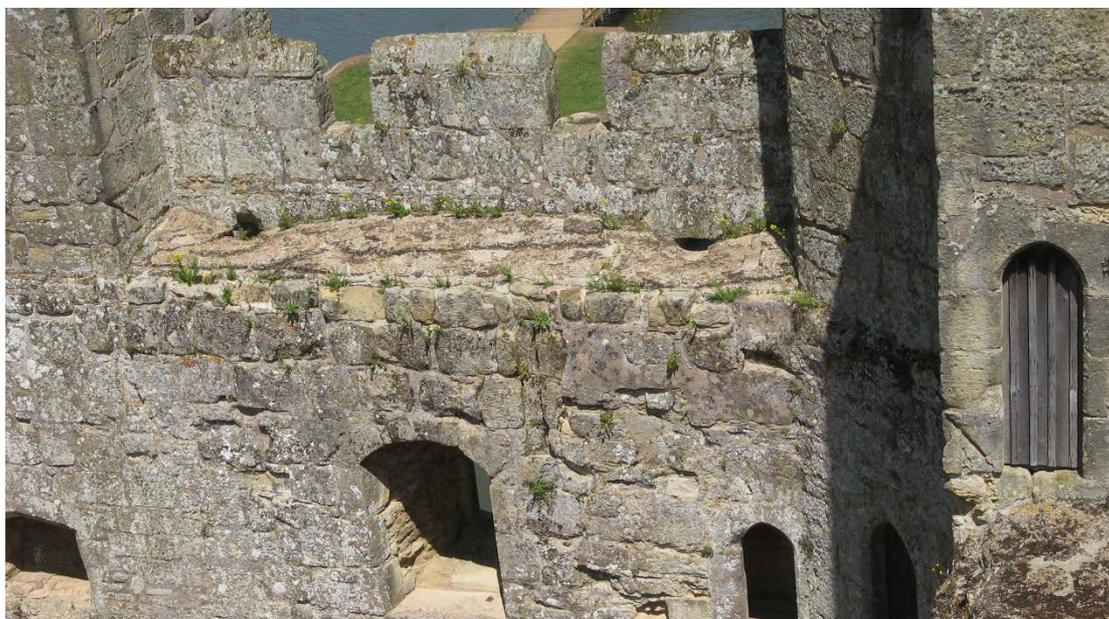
The north-east corner of the courtyard ranges, showing truss positions indicated by wall post slots, flashing lines, and drainage across the wall walks to a pair of drains under the parapet
